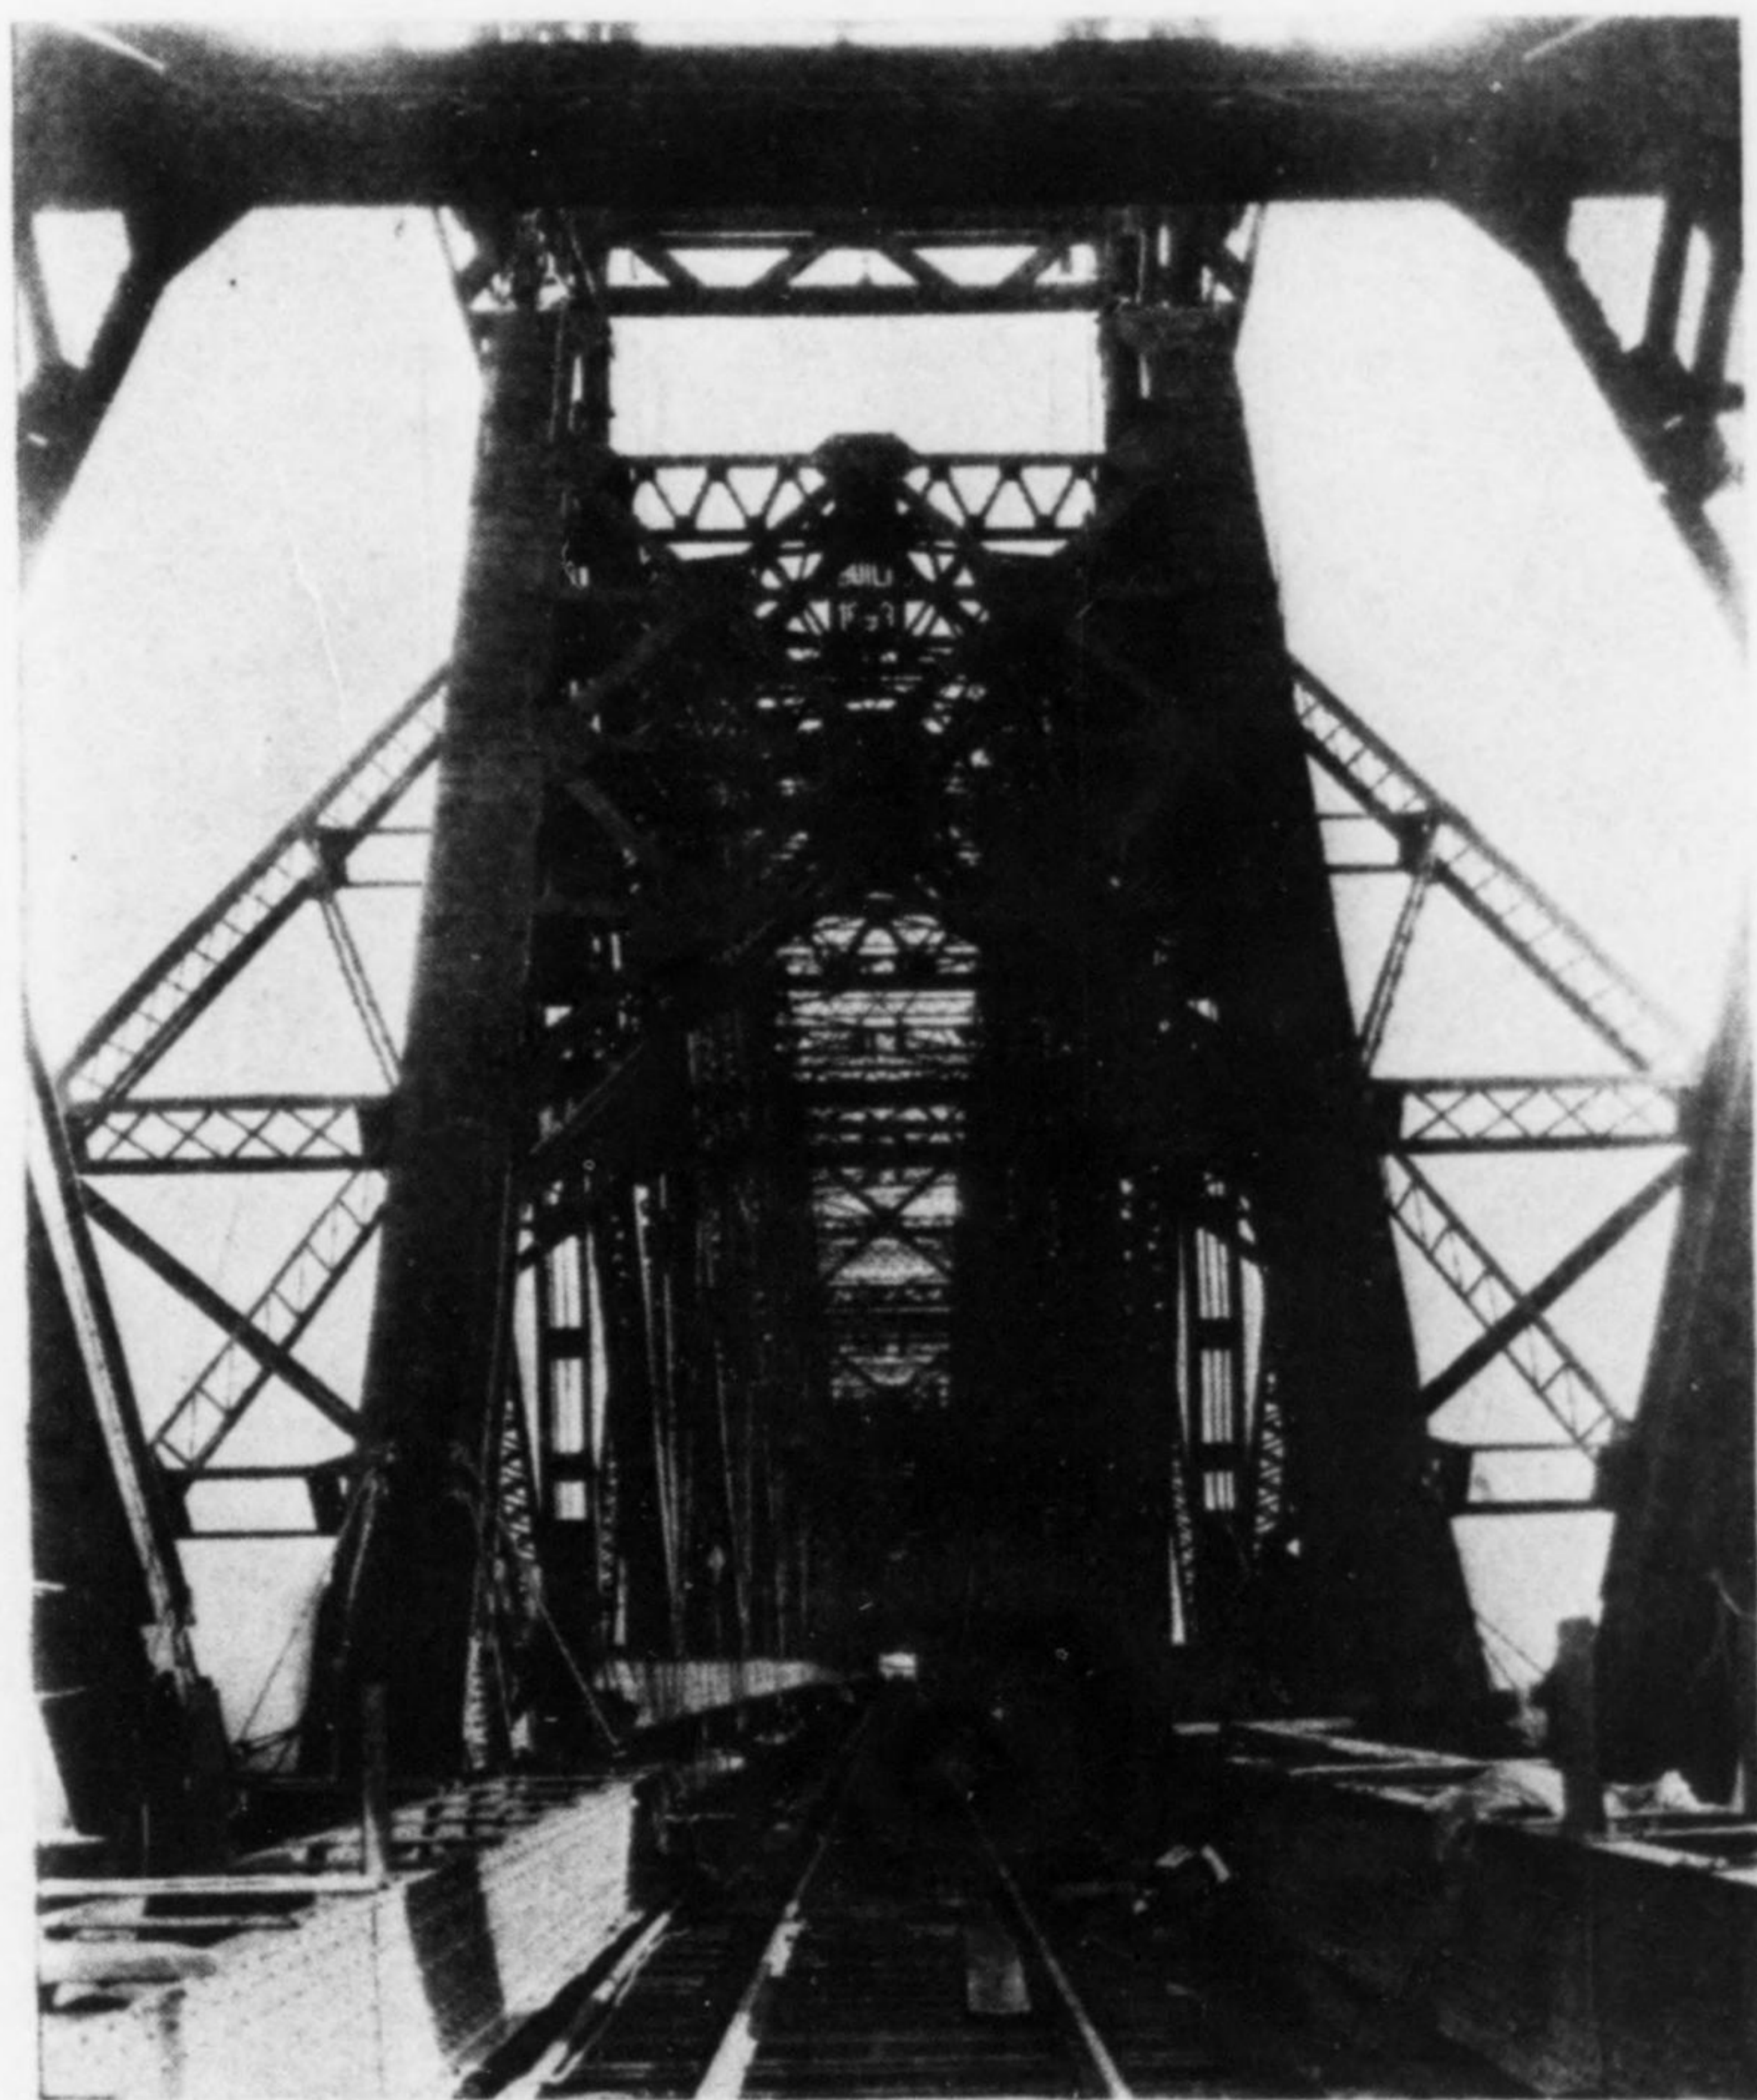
NEW 547-FT. TRUSS BEING ERECTED WITHIN THE OLD TRUSS
